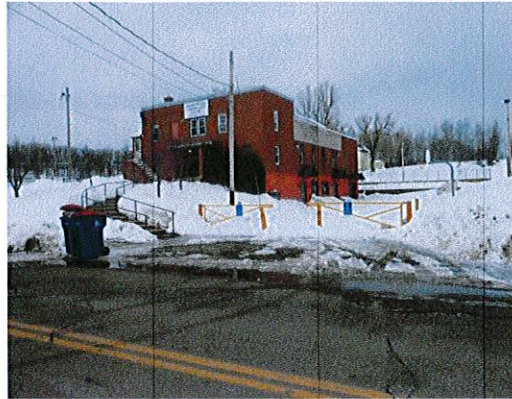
There is not currently an interior accessible route between levels. An on-grade entry is provided to the upper and lower levels. (There is not currently a route to the 3rd floor former apartment.)
